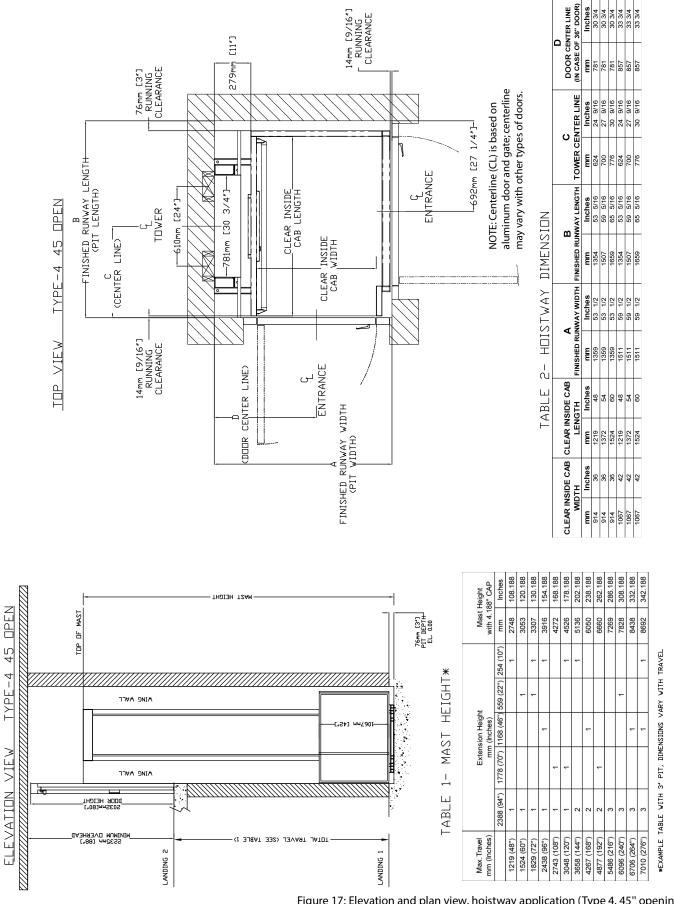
Elevation and plan view, hoistway application (Type 4, 45" opening)
